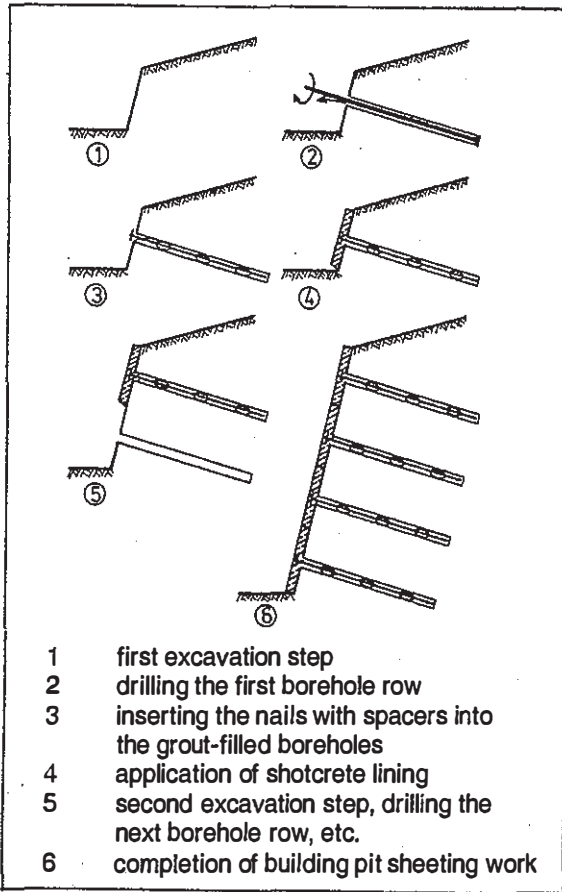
Soil nailing for building pit sheeting work: execution steps.
